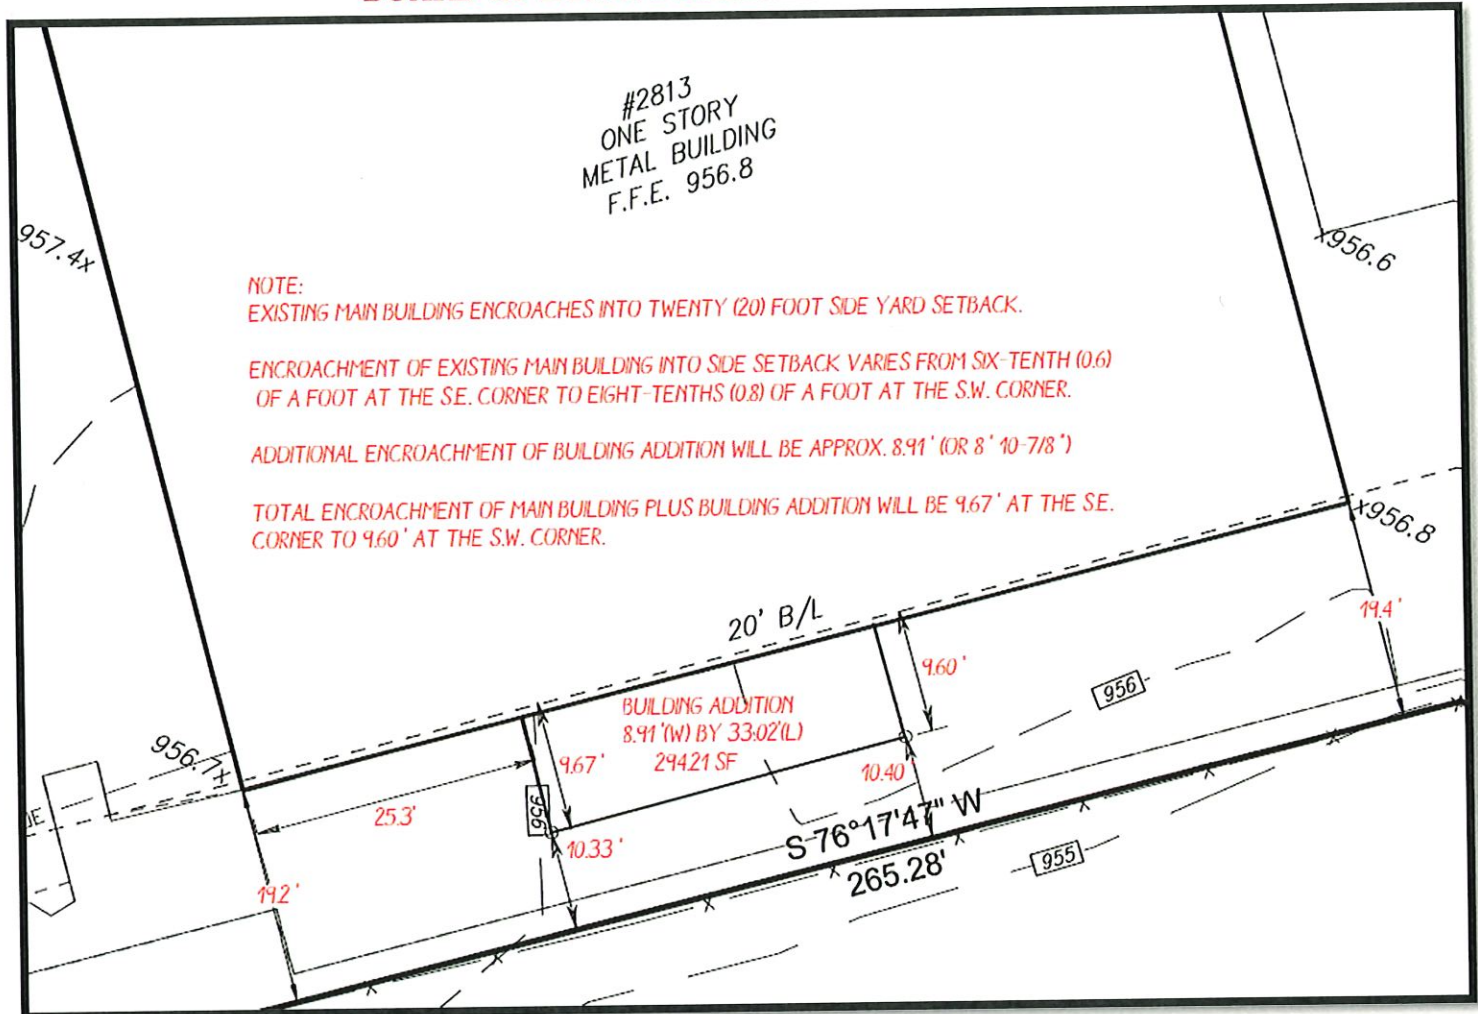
V-21-004 Variable Steel Conceptual Site Plan enlargement showing dimensions. See attachments for full conceptual site plan.
